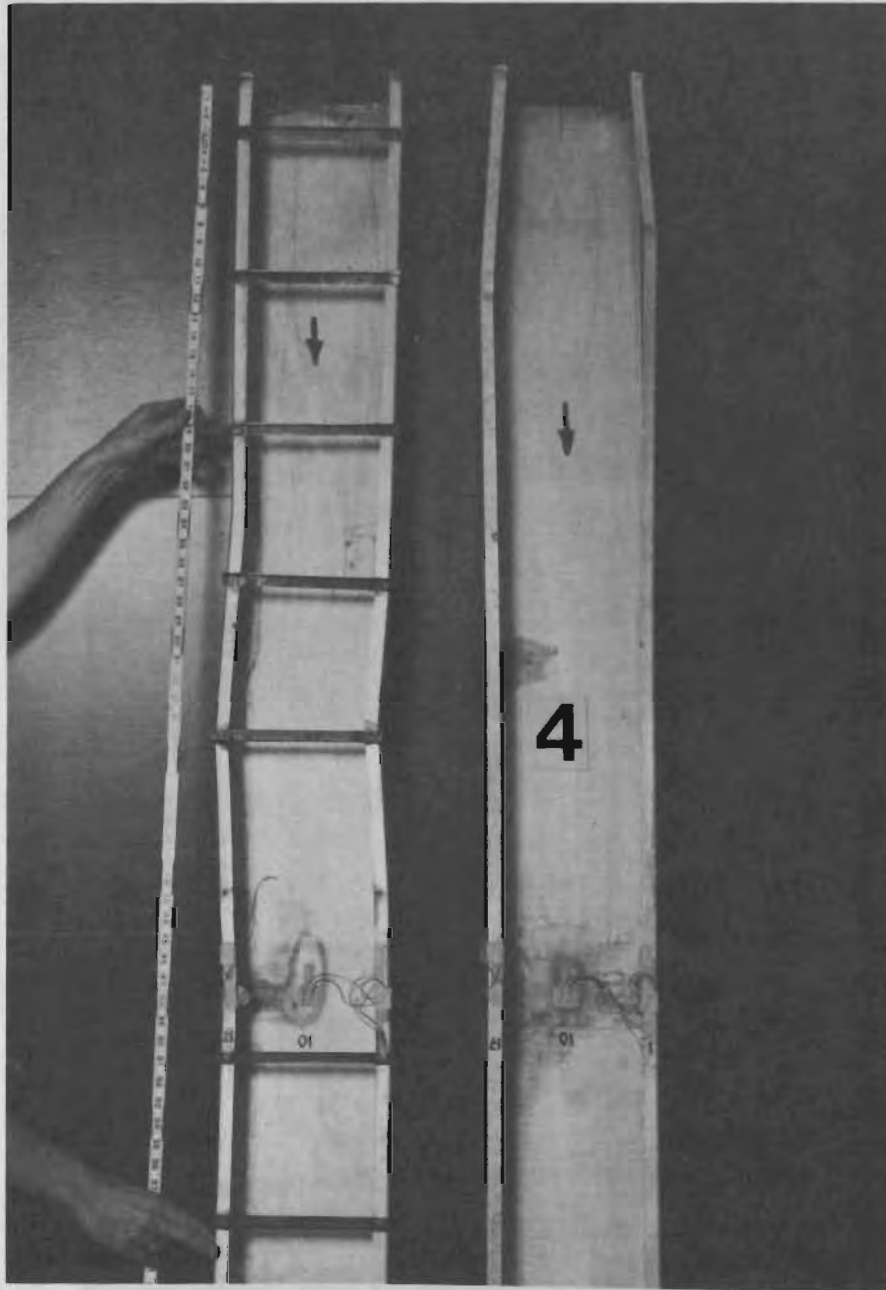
FAILURE MODES FOR ECCENTRICALLY LOADED LONG COLUMNS
